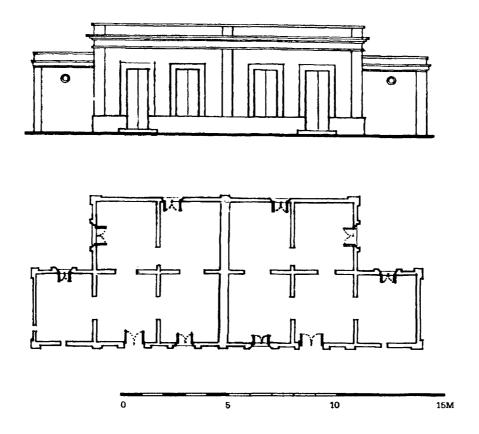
Elevation and plan view of model #3b casilla in Cayey.
